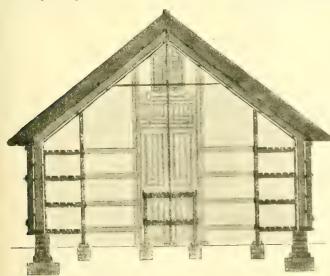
SECTIONAL ELEVATION OF TRUIT-ROOM.
